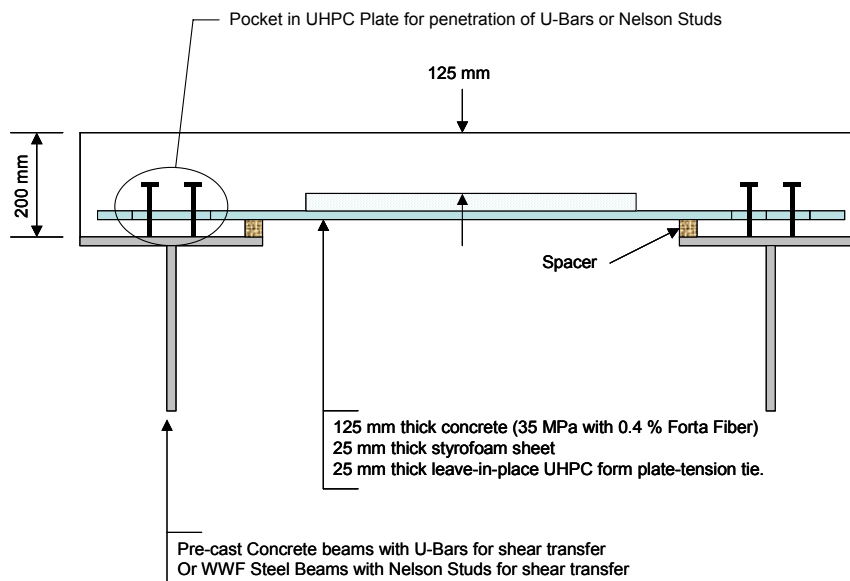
Section through a stay-in-place UHPC form on a steel-free bridge deck
